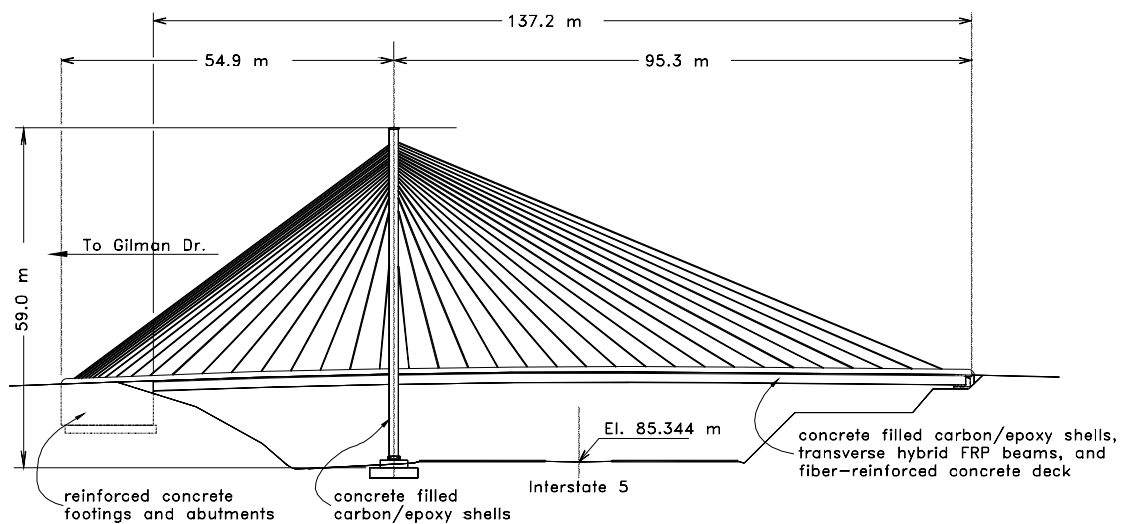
Elevation of I-5/Gilman Advanced Technology Bridge (Brestel et al., 2003)
